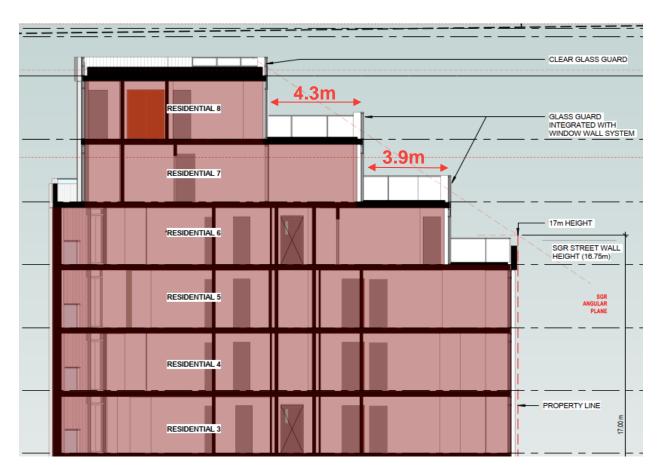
Illustration of required balcony encroachment variance for angular plane encroachment. View from eastern face of building. See sheet A1.14 – Main Building Section in Architectural Building Package for full image.
